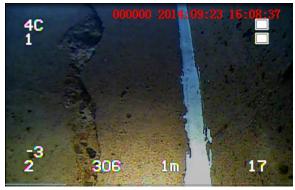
Spalling a metre or so below spillway crest to left of J1.
